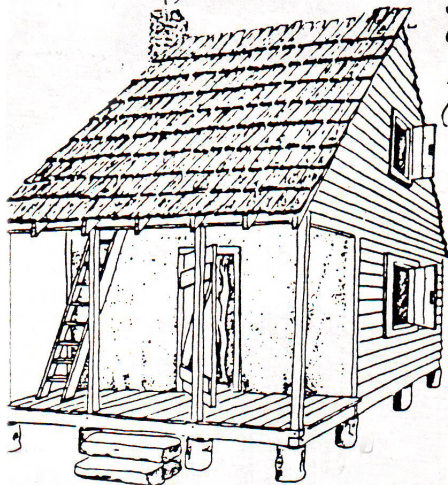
Typical Acadian/Cajun cottage drawing, w/ gable roof, porch-- w/ French tiles/ Típica casa acadiana, con techo inclinado y tejas francesas.
